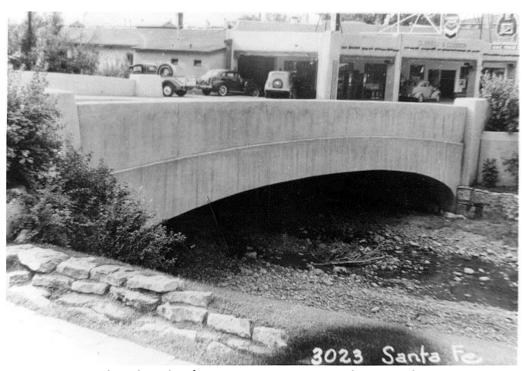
Completed Bridge (courtesy New State Highway and Transportation Department, Bridge Design Section Files, Bridge Inspection File # 3023)
